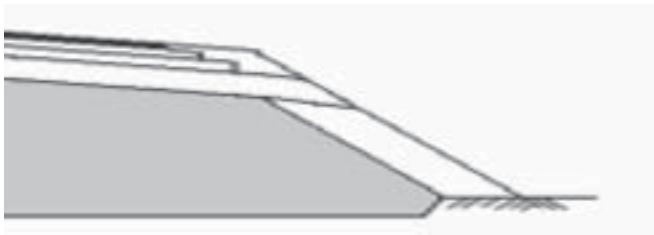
Excavation of earth from alignment of embankment for providing side cover
